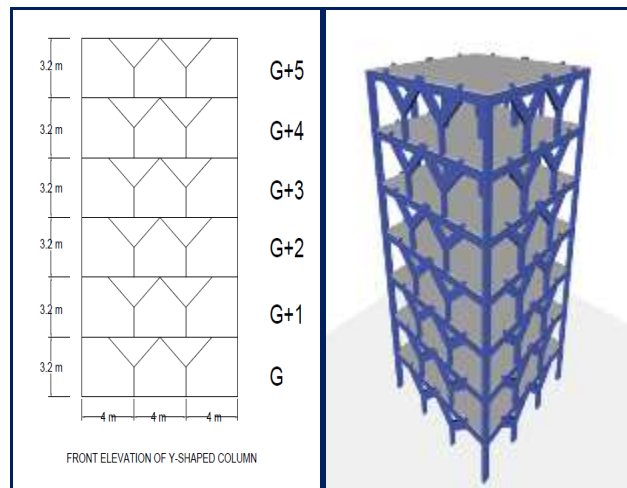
Elevation of Model 2 (G + 5 Storied RC Structure with Y- shaped Columns)
